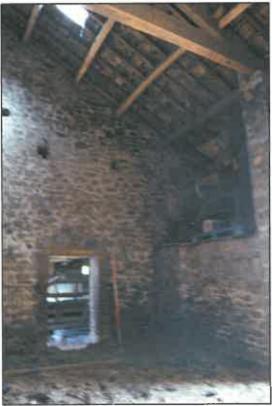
View of king post trusses and timber roof structure to Barn no.1.
